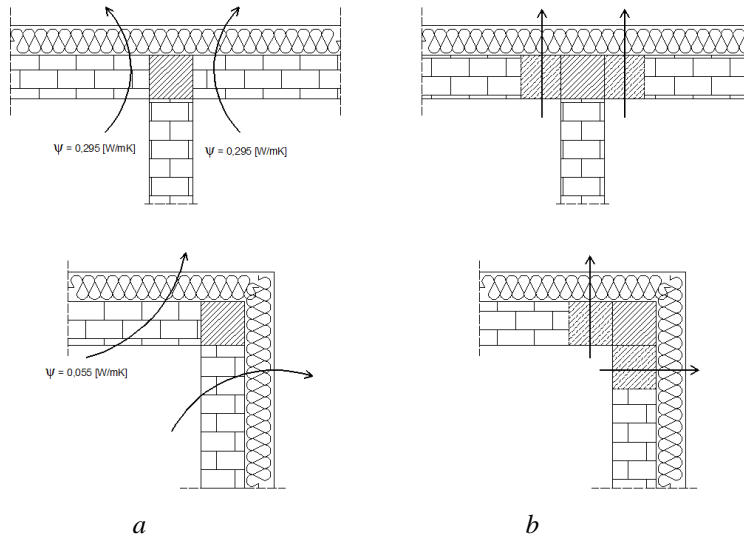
a* – Typical thermal bridge; *b* – Modified geometry of the thermal bridge.
